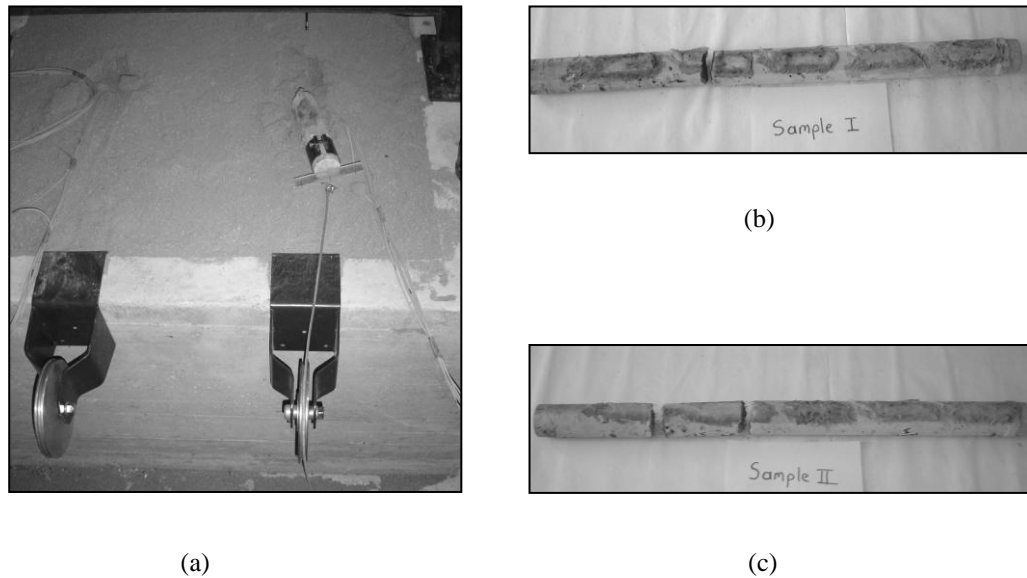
Failure patterns of model piles (a) Pull-out behavior (b) damaged concrete pile (c) damaged *s/frc* pile with 1.5% steel fiber.
